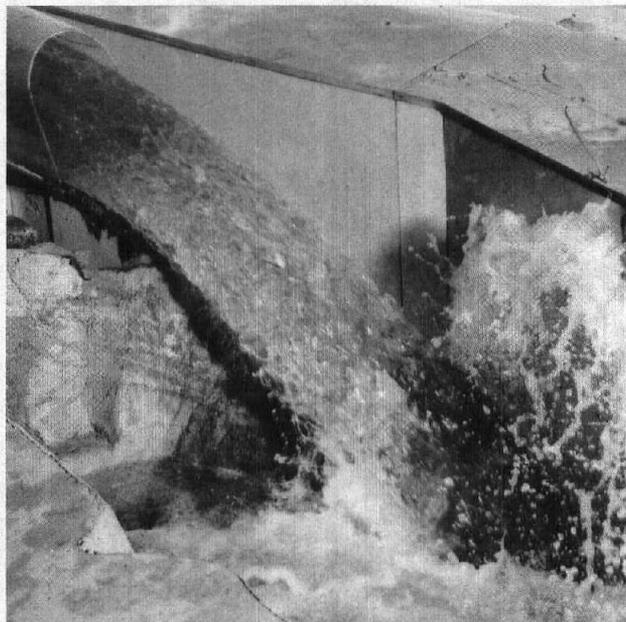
Spillway jet impinging on canyon wall before realignment of the end of the tunnel,  $Q = 75,000 \text{ ft}^3/\text{s}$ .
